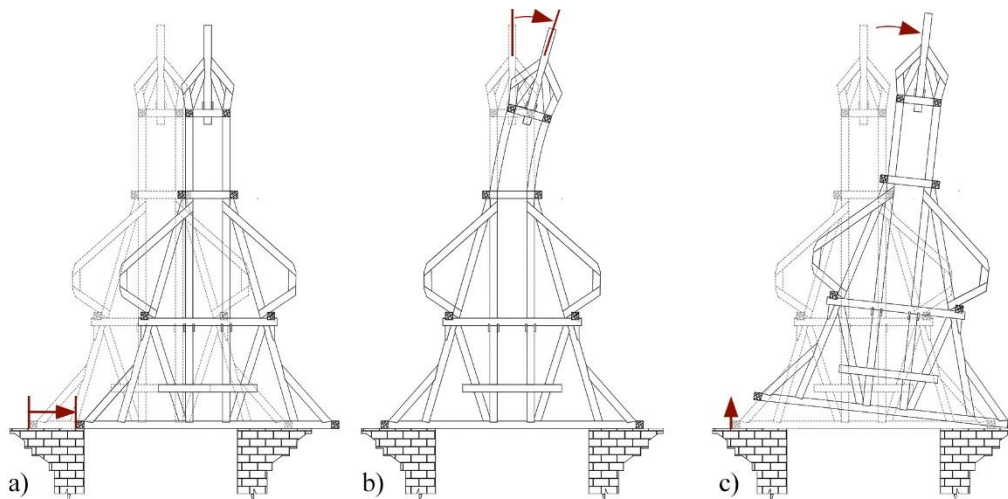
Failure of bell tower roof structures influenced by support type (a) sliding support - sliding failure; b) rigid support - local failure at the top of the structure; c) sliding support with free vertical displacement - overturning-sliding failure) [112]
